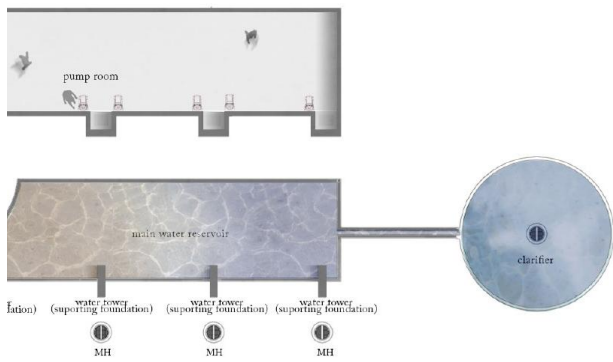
Sketch plan of final plan layout of Urban (infra)Structure (Author, 2015).
